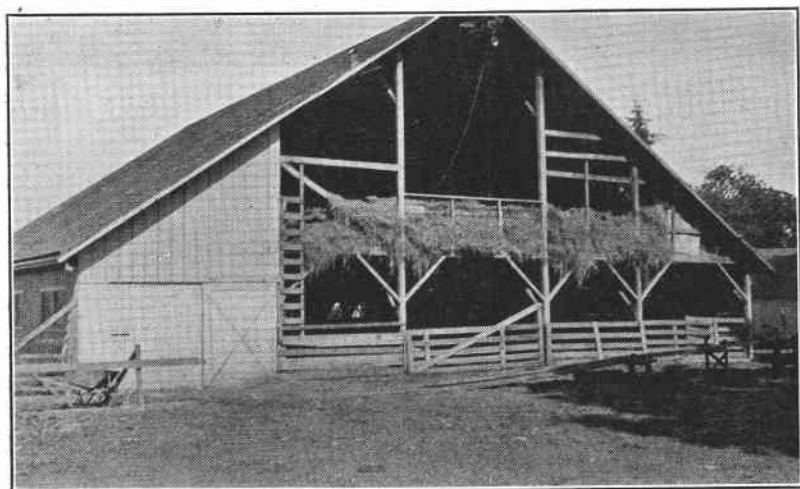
Straw shed and covered exercise yard with concrete foundation and piers. Manure about 2 to 2½ feet deep.
